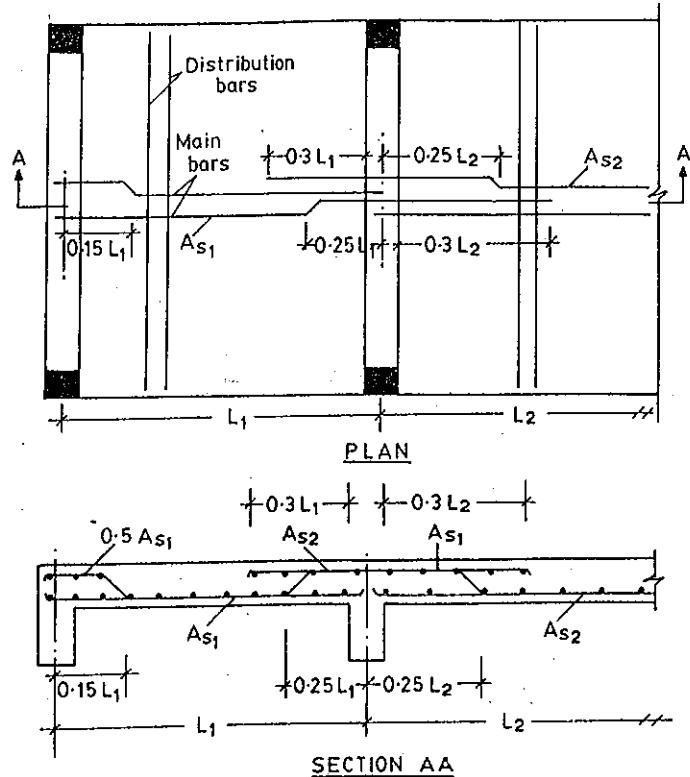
Typical Detailing in One Way Continuous Slab (SP-34)
